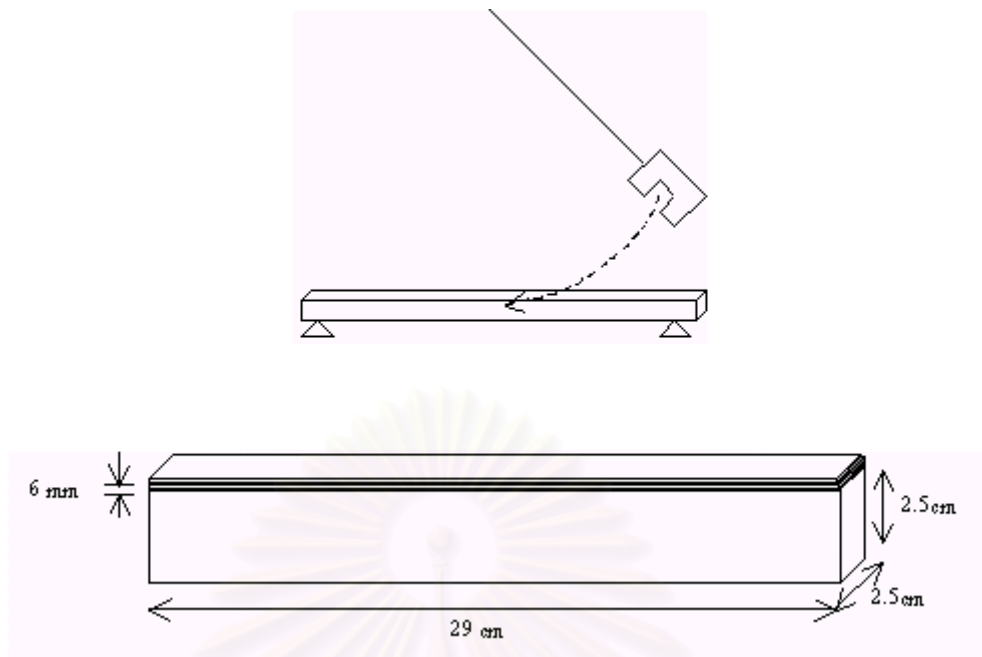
The arrangement and dimension of mortar coated specimen.
